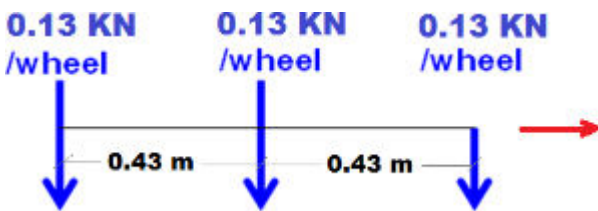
Loading configuration of MOC truck (Truck Loads).
